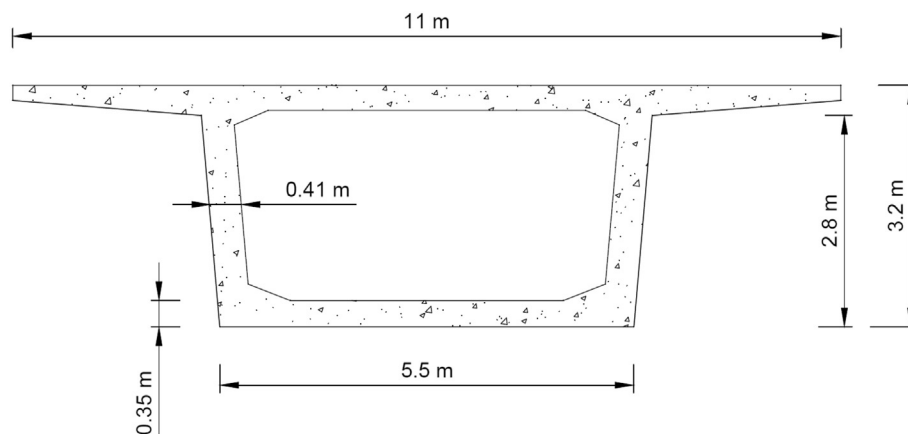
Cross-section of the concrete bridge deck at Ensenada do Engano (dimensions in m).
